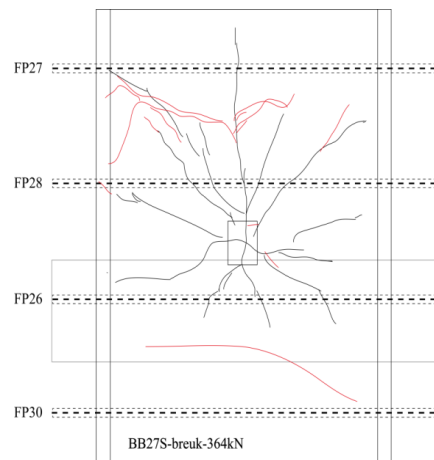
Crack pattern at failure, static test no. 2 [15]
